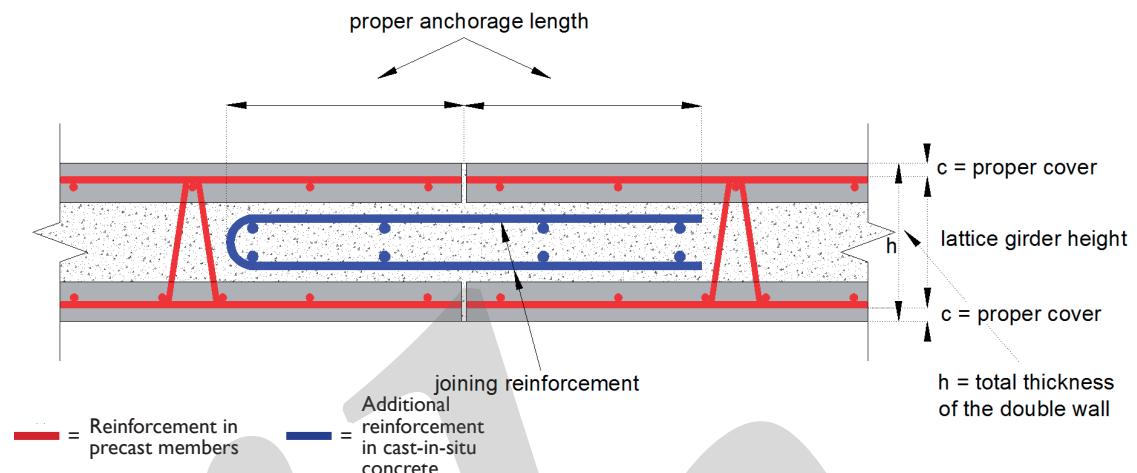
Horizontal section of connection of double walls in a straight line
